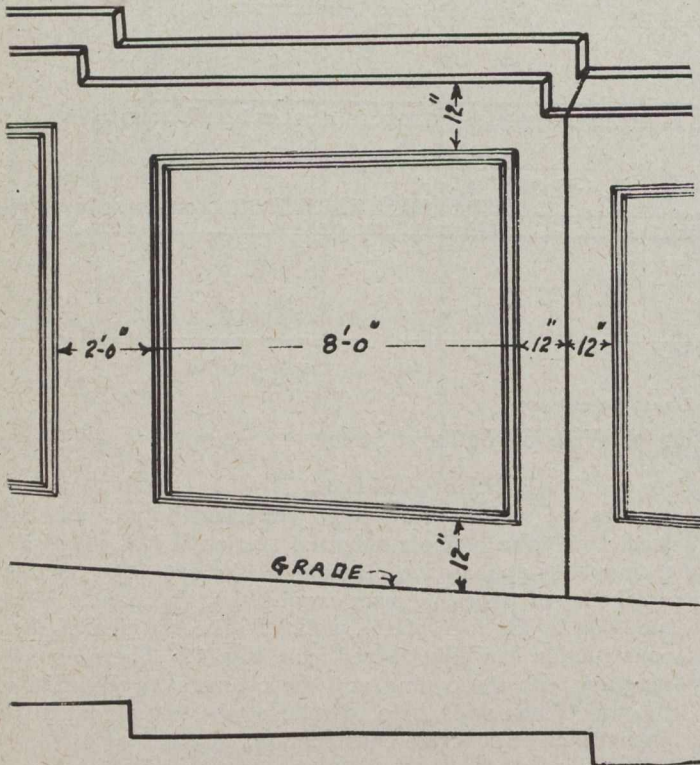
Detail of Panelling of Wall, also Showing Location of Expansion Joint.
